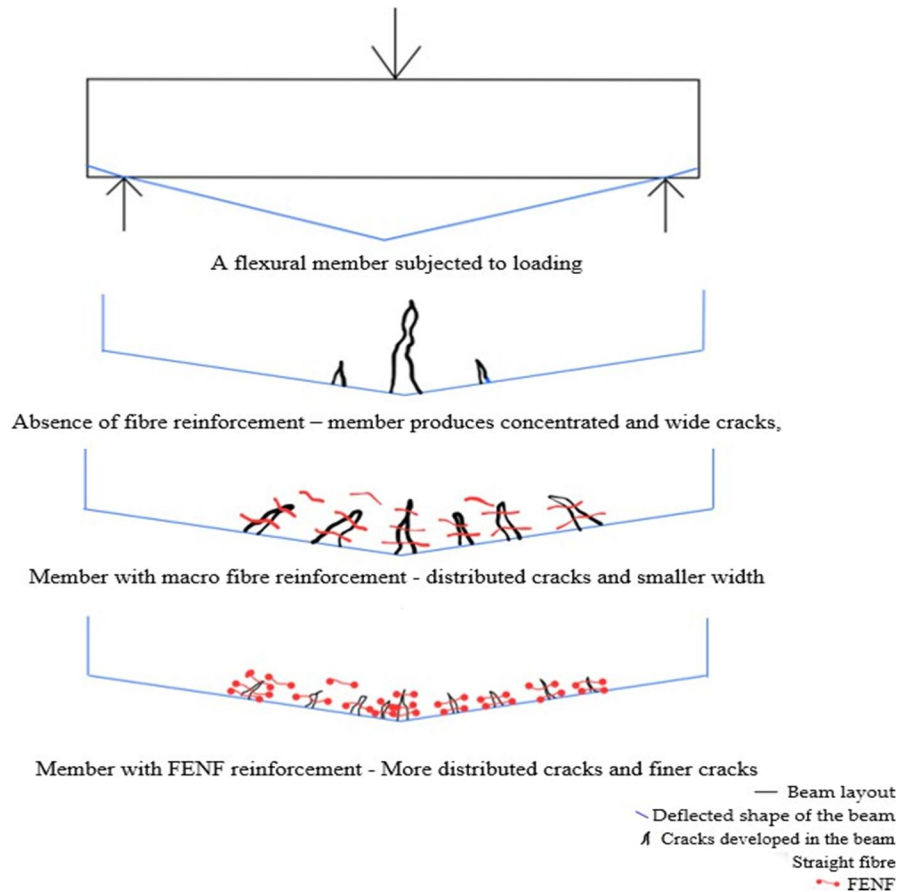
Working mechanism of FENF in concrete: the flattened end acts as a mechanical anchor, preventing pull-out and enabling crack-bridging stress transfer [3].
